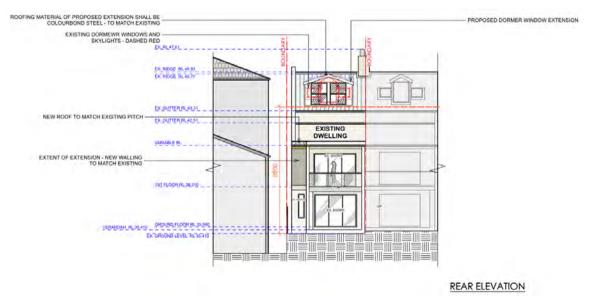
Rear Elevation, Dwg No. C5 Rev G
